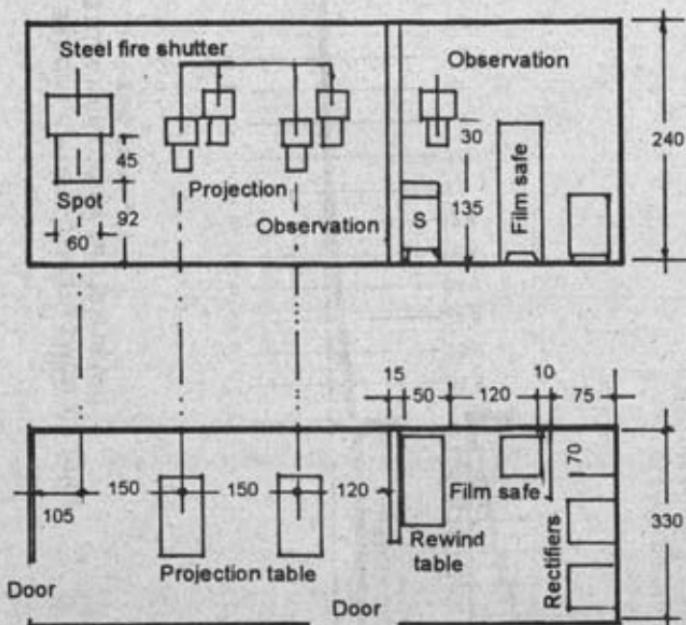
PLAN OF THE PROJECTION ROOM
